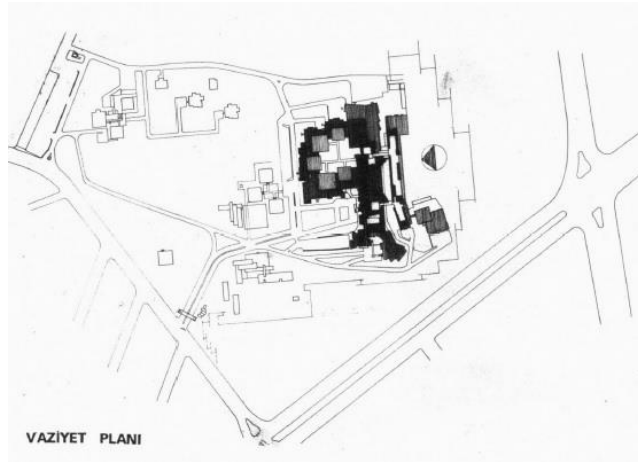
Site Plan, Gülhane Military Medical Academy Hospital
